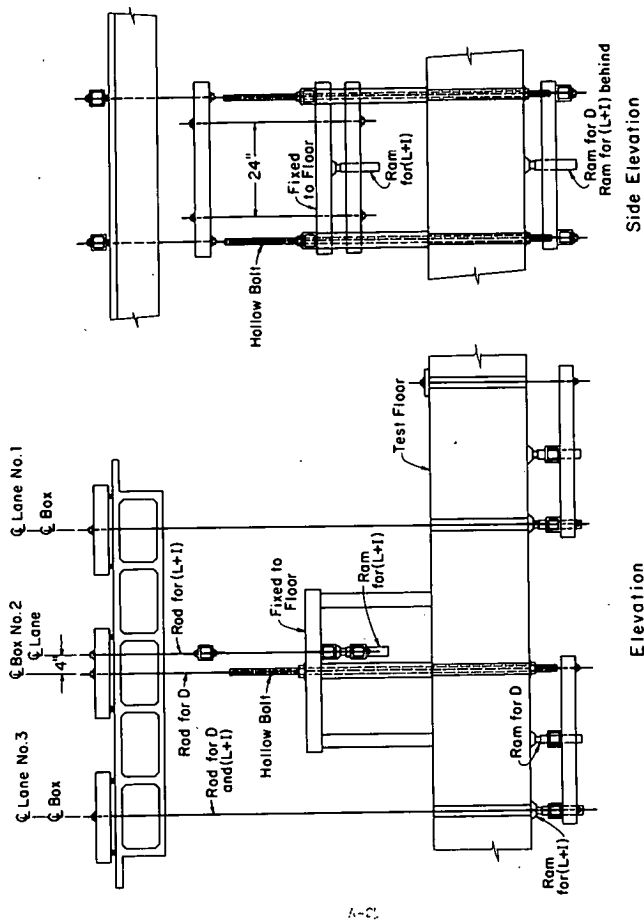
Loading Apparatus in Span for Single-Column Model Bridge
